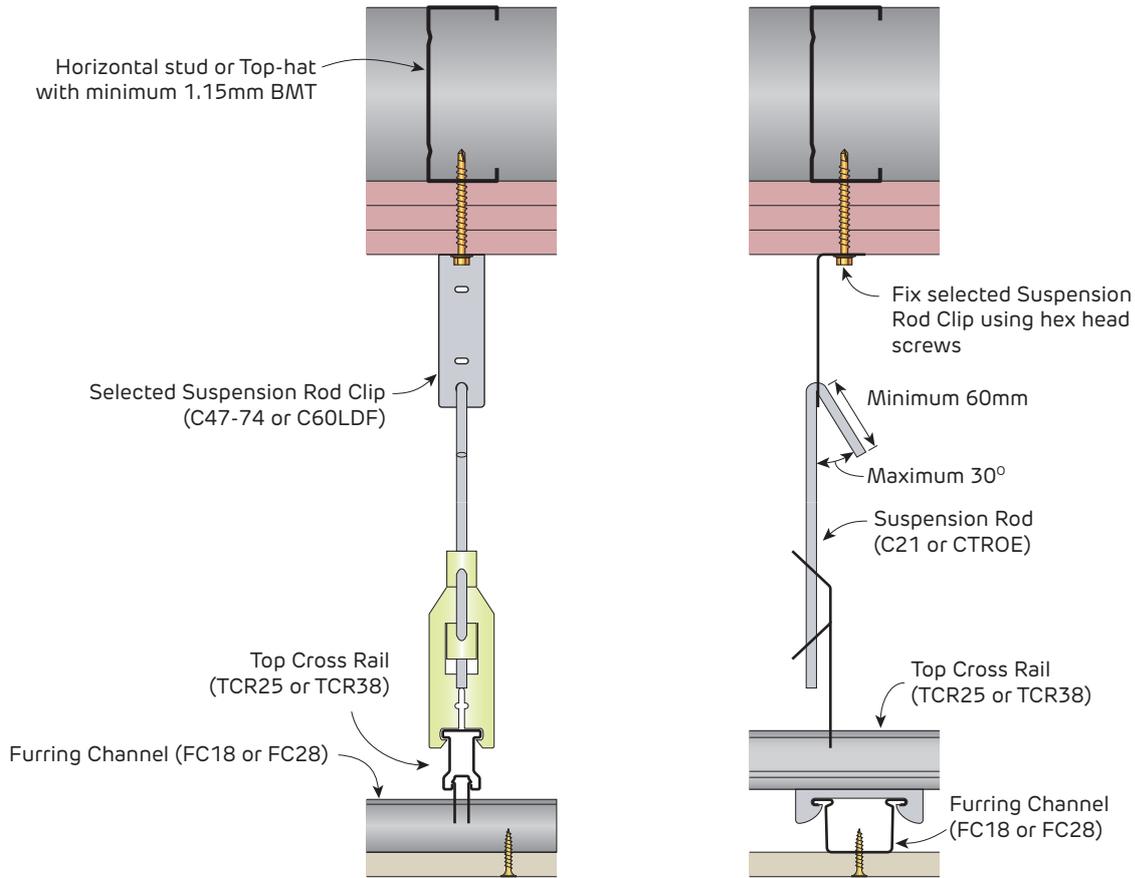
Suspended Ceiling under a Fire Rated Ceiling
